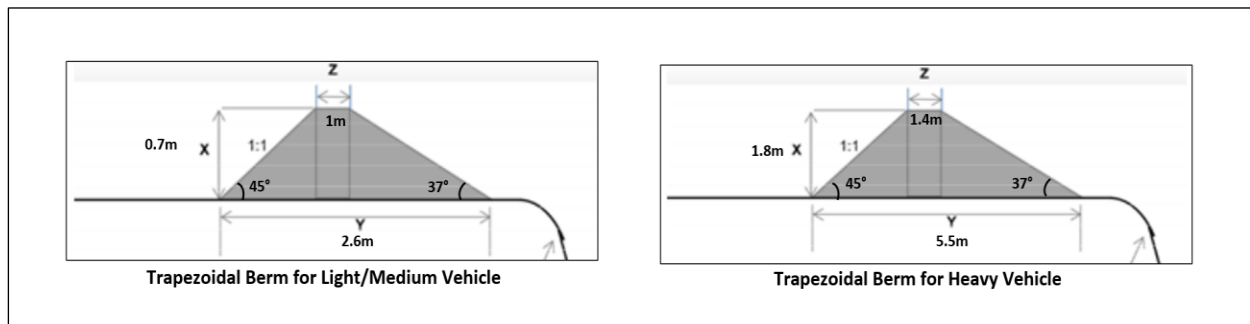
Minimum requirement for Trapezoidal berm dimension for Vulcan mine
